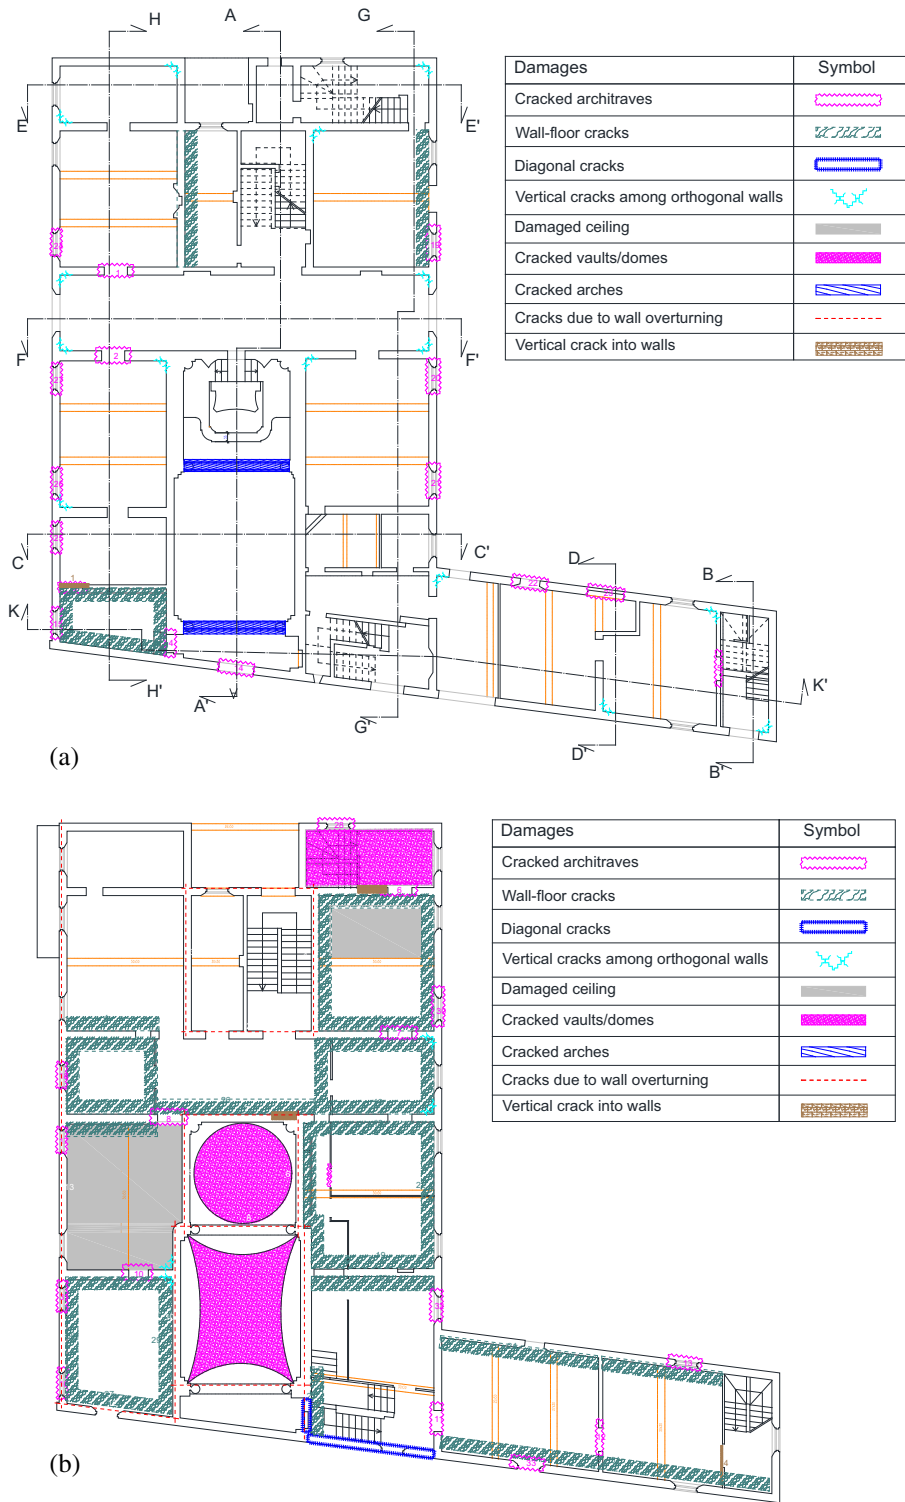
Damage patterns at the ground (a) and the first (b) floors.
